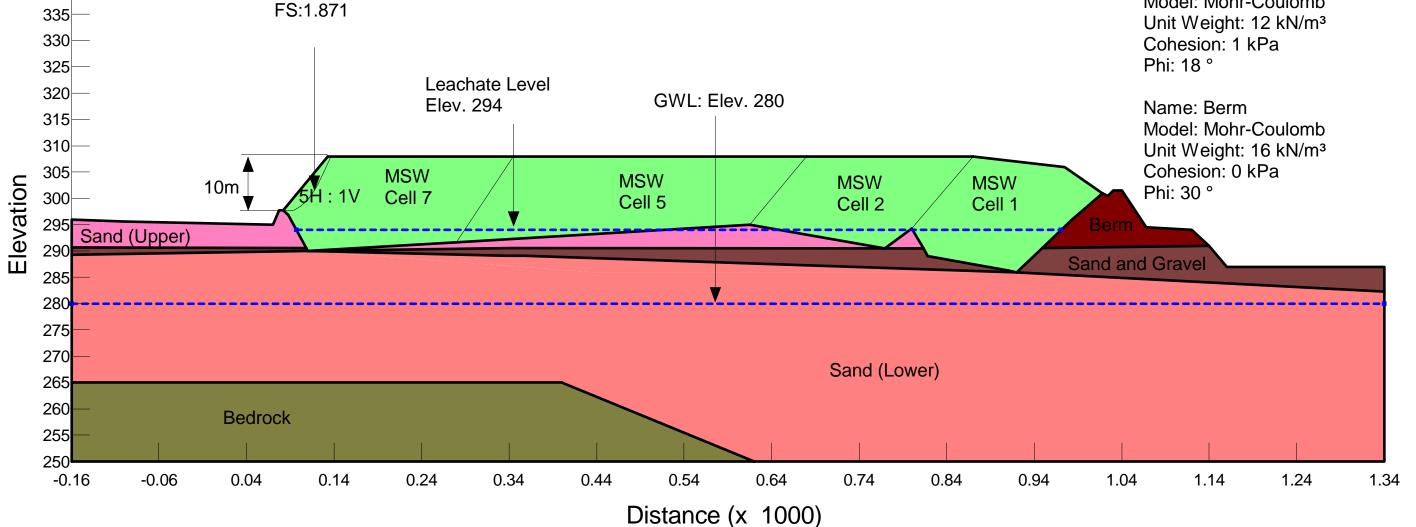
Cell 7 Excavation - Section 0+700 - 2014
